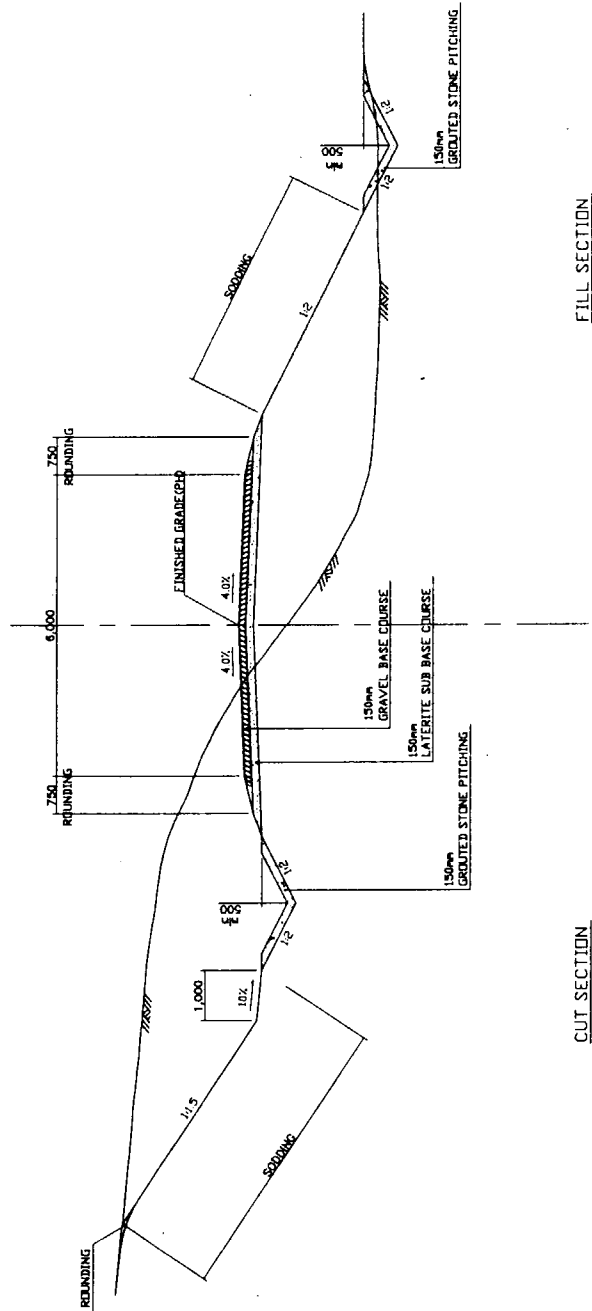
TYPICAL ROAD CROSS SECTION
